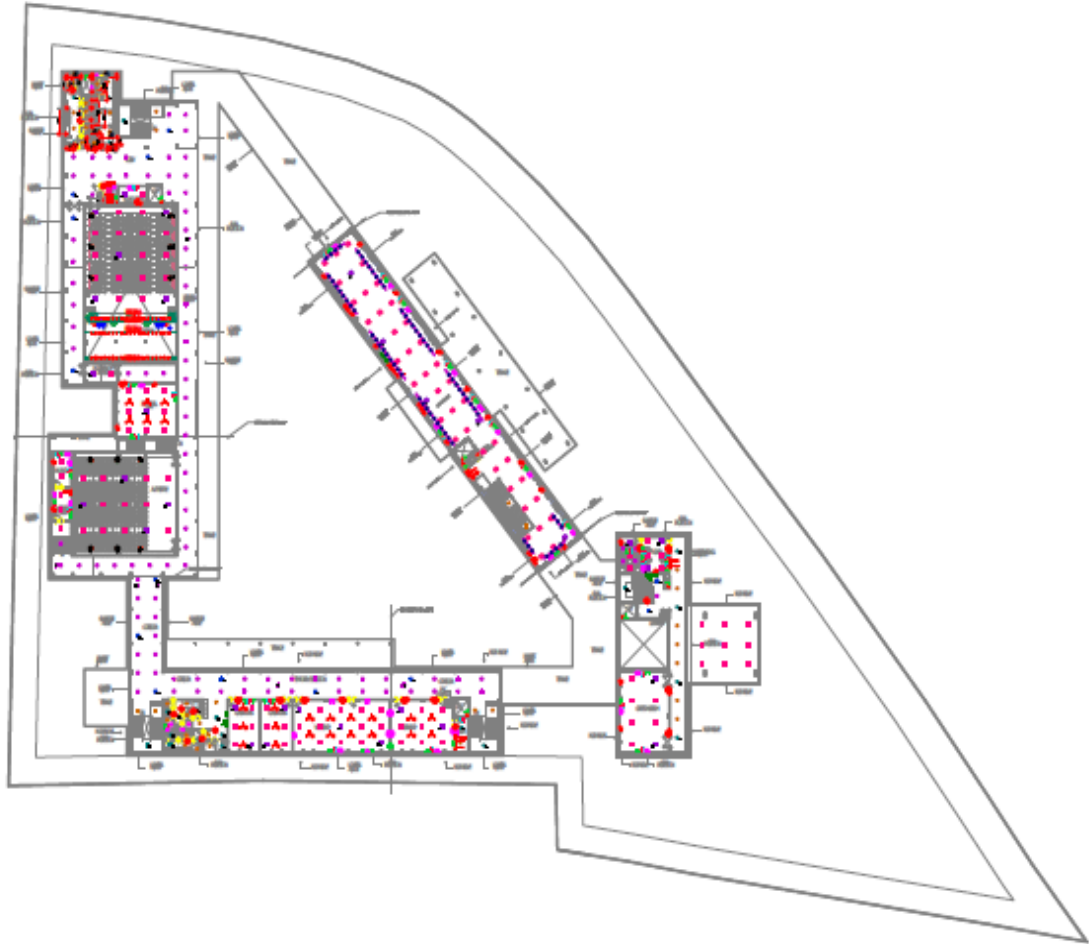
Layout of First Floor Plan of Convention Center
